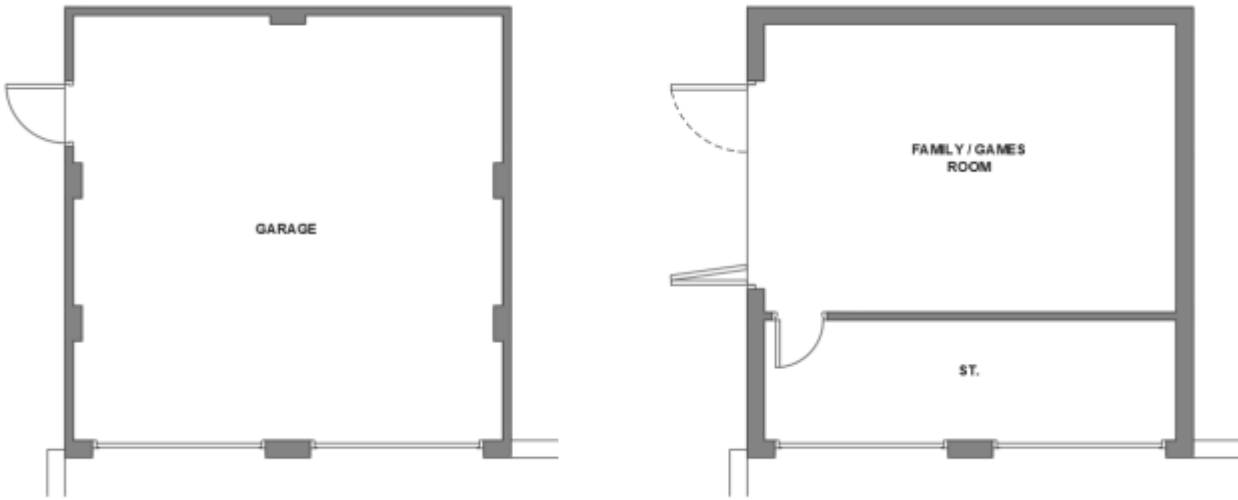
EXISTING AND PROPOSED FLOOR PLANS
